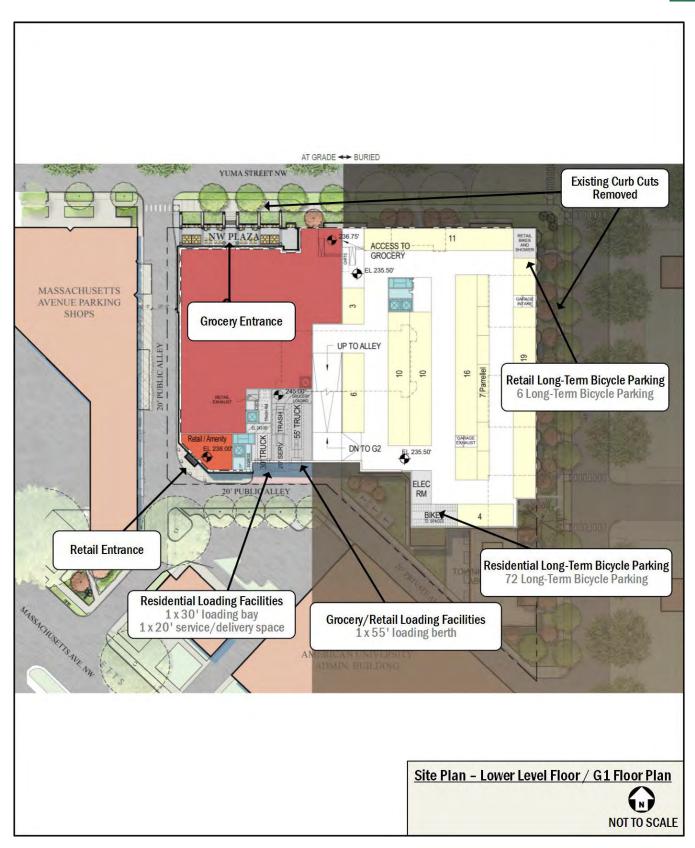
Site Plan – Lower Level / G1 Floor Plan
